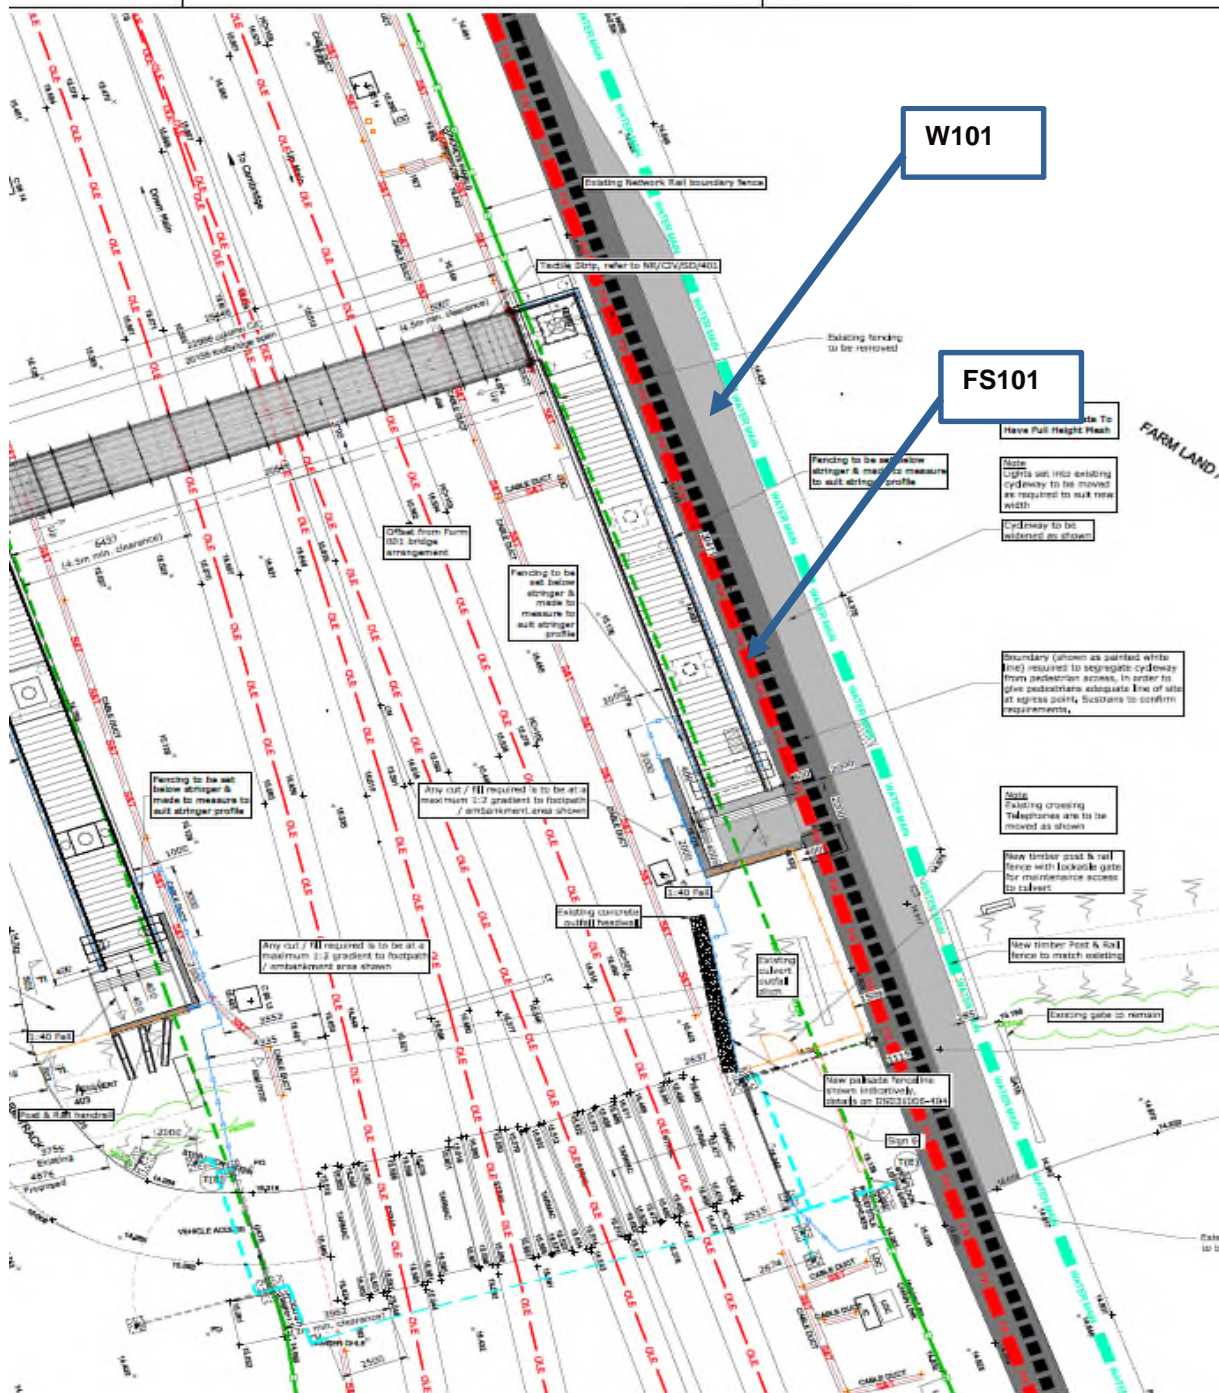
Foul Sewers south of BGK-1544c Nine Wells Bridge
